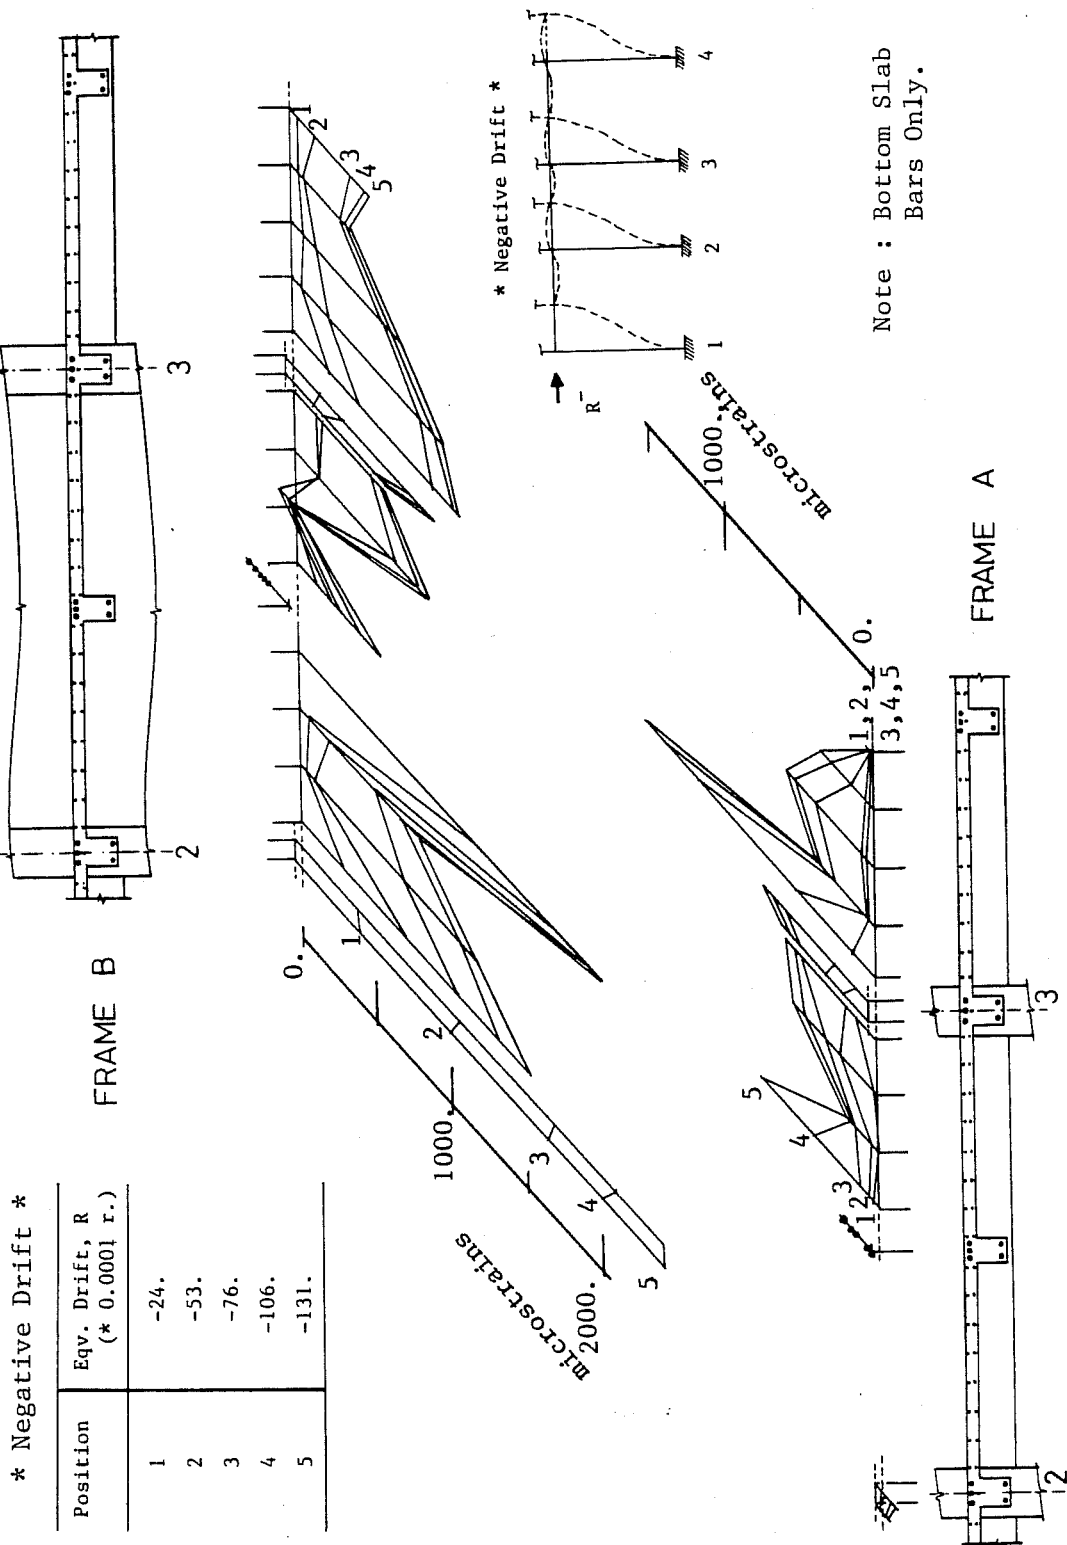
BRI Building - Transverse Slab Yielding in Level Z2.
